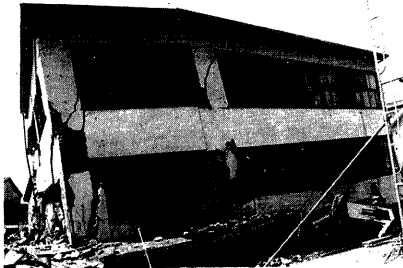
Example of damaged reinforced concrete buildings.
